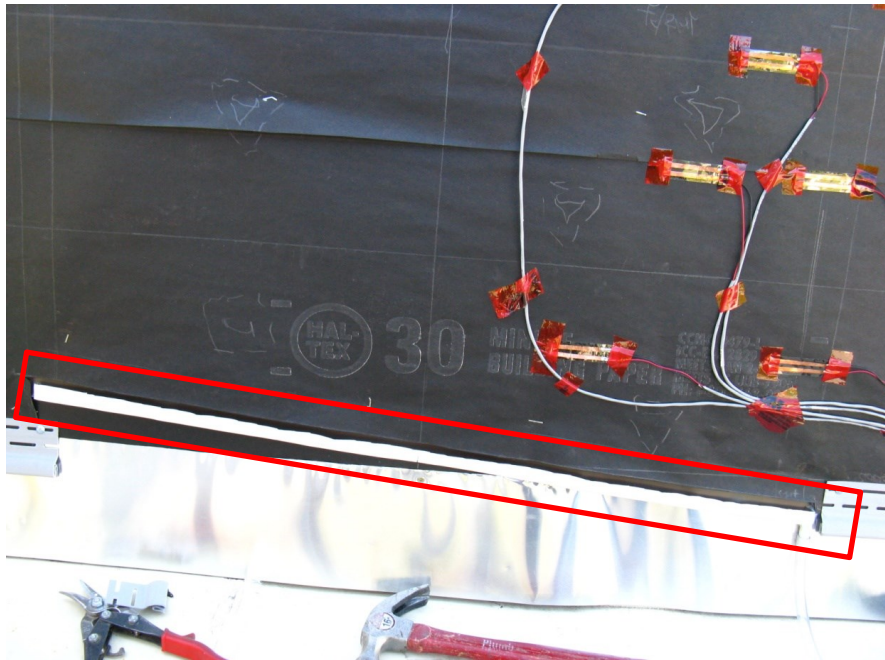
Bottom-of-wall aluminum trough at a typical vinyl siding long term performance walls.
